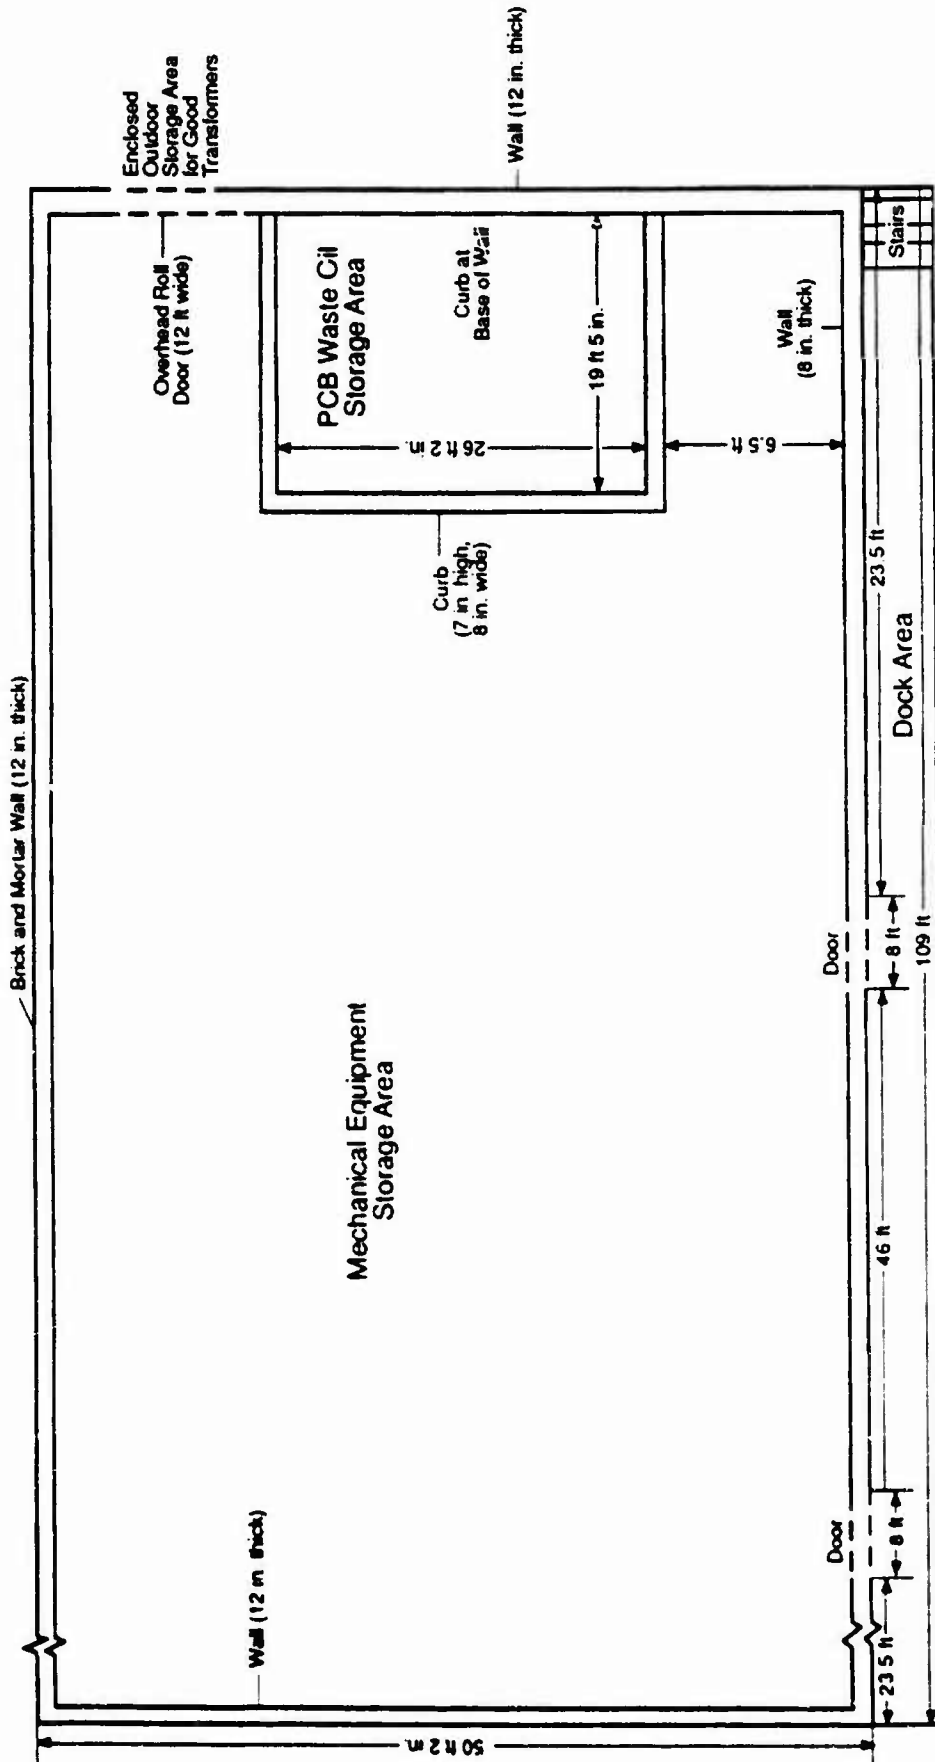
Floor Plan of Building 3114 (Source: Adapted from Poster Wheeler 1987a)
